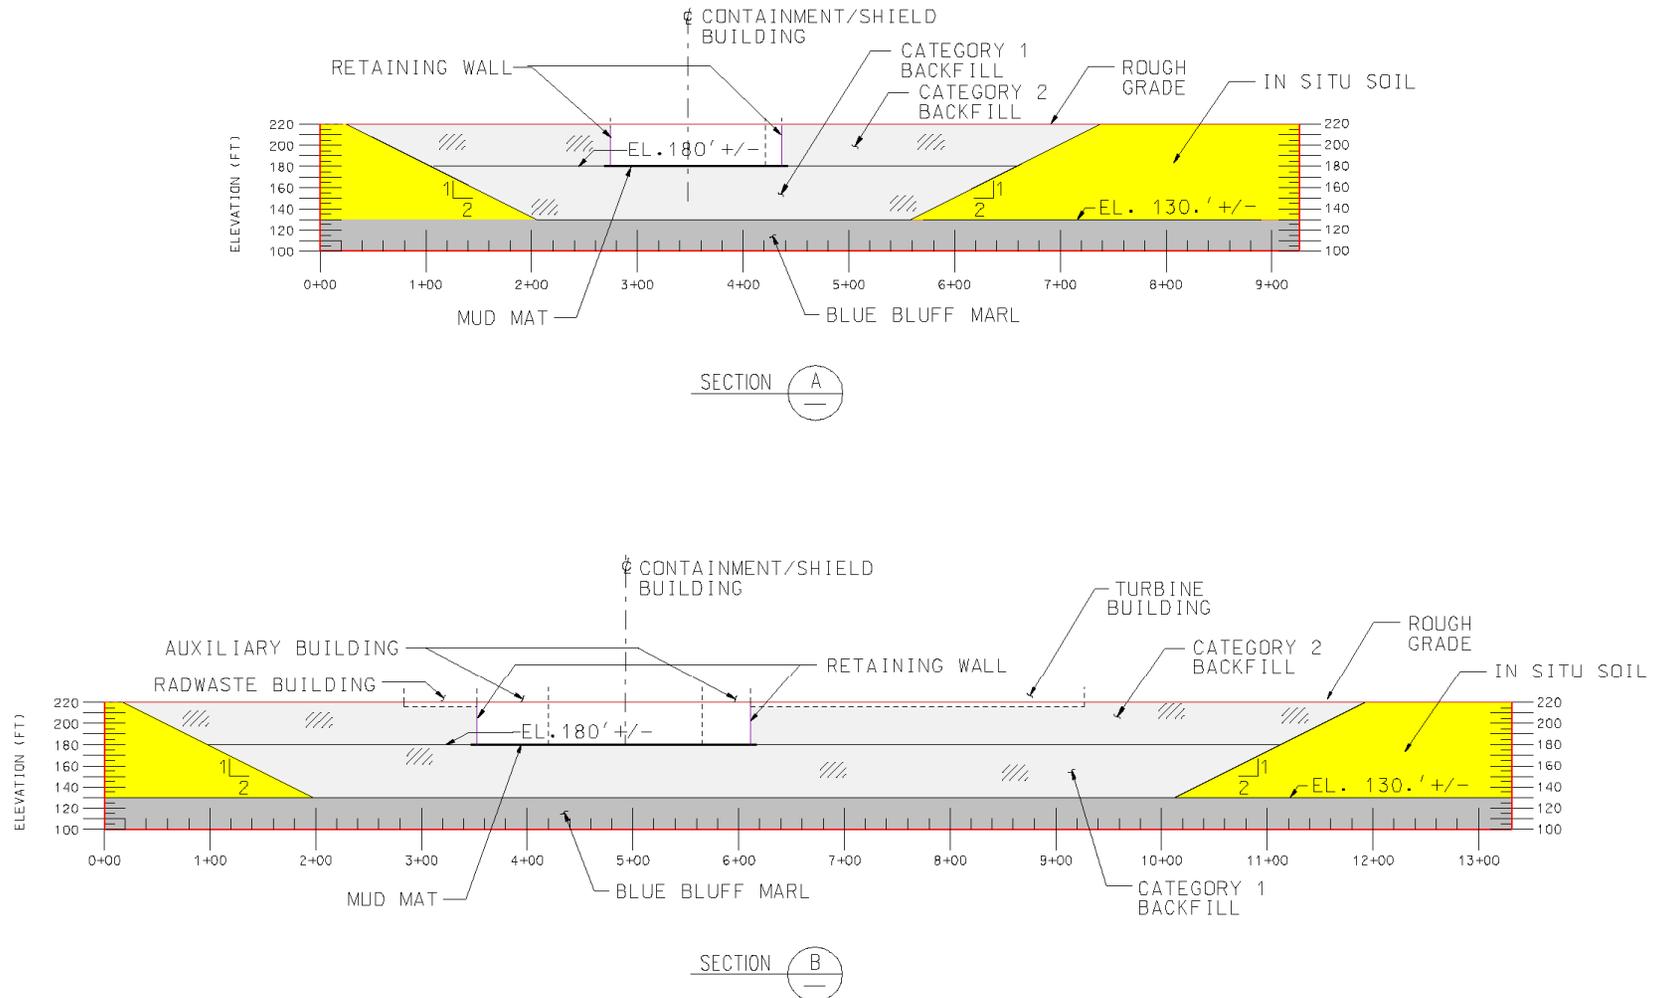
Power Block Excavation and Switchyard Borrow Area
